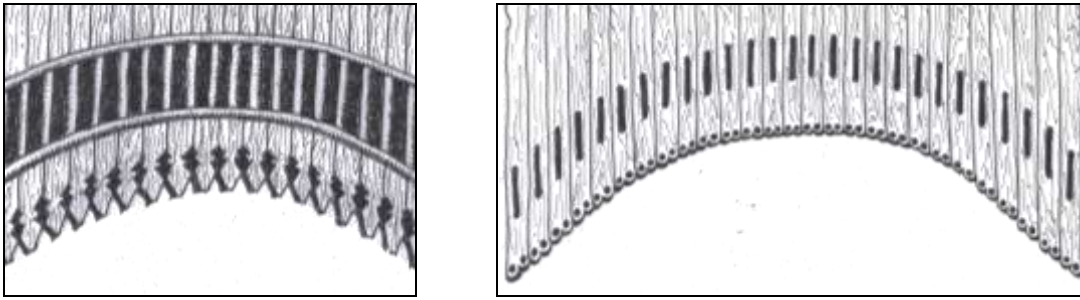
Ventilating Frieze Patterns of Wall over Entrance Stair in Contemporary Houses
